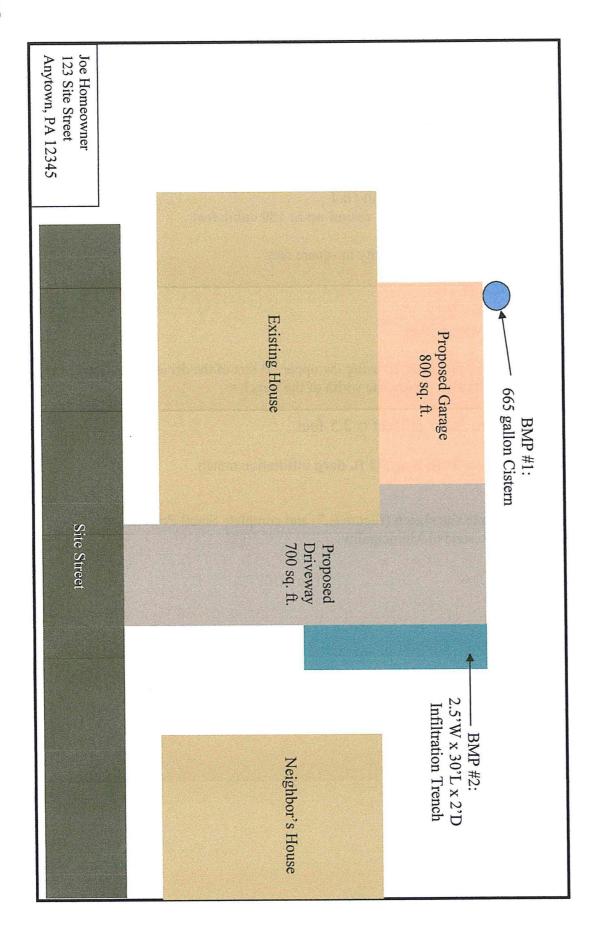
Simple Site Sketch of Proposed Project and Proposed BMPs.
